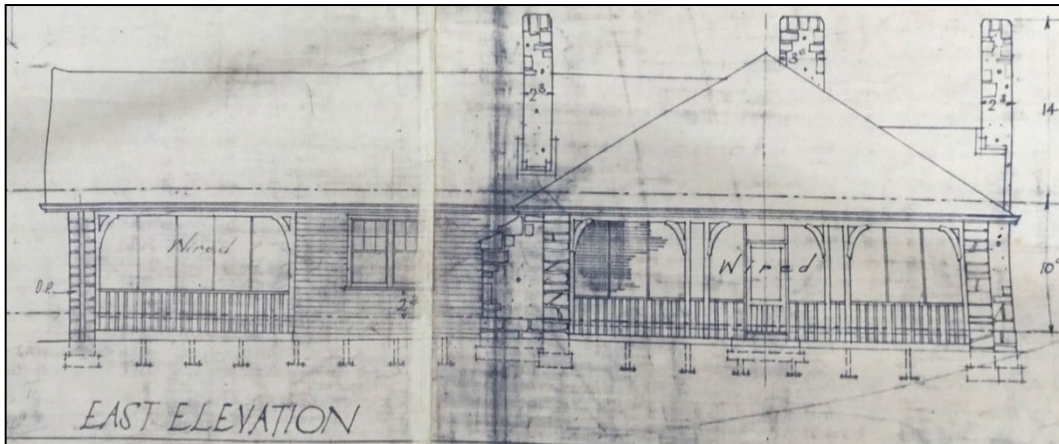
East elevation. Drawing by architects Oakley & Parkes, dated December 1930 (2018 owner's collection).
